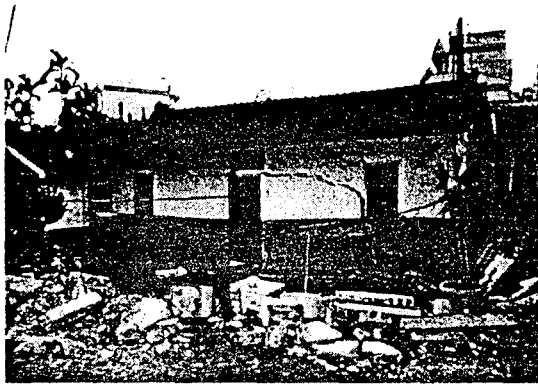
Damage of brick structure (Shihkang, Taichung County)
